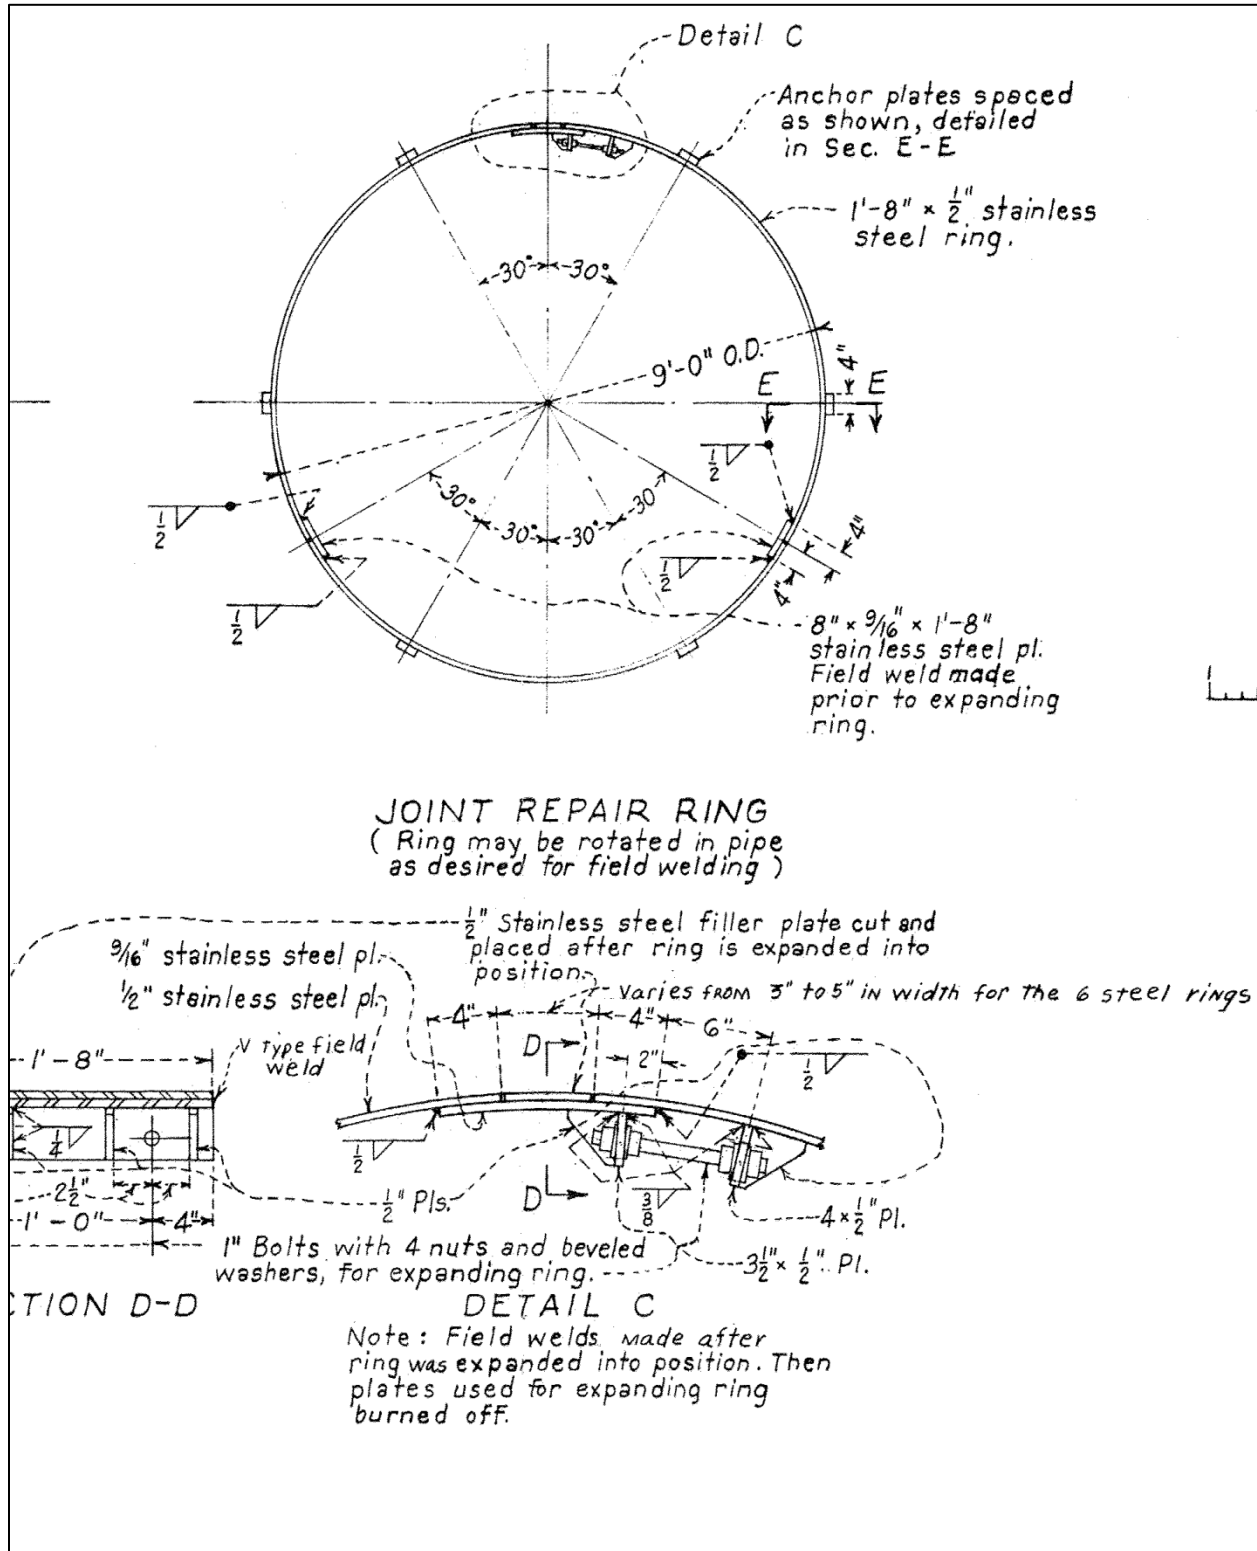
Schematic of a field-welded steel joint repair ring (USBR: ASBUILT Plan 783-D-650).
